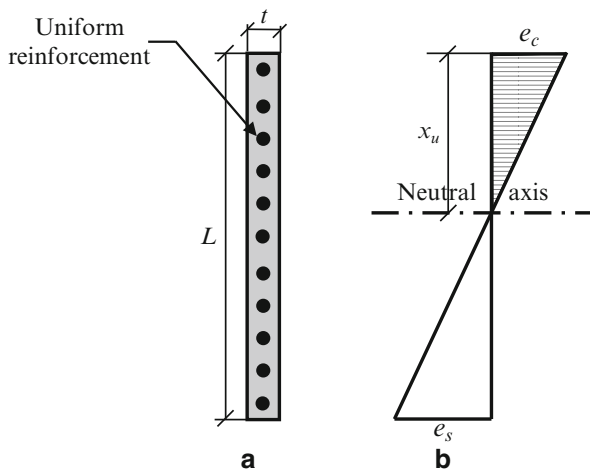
Slender wall in flexure (a) Wall plan, (b) Strain diagram
